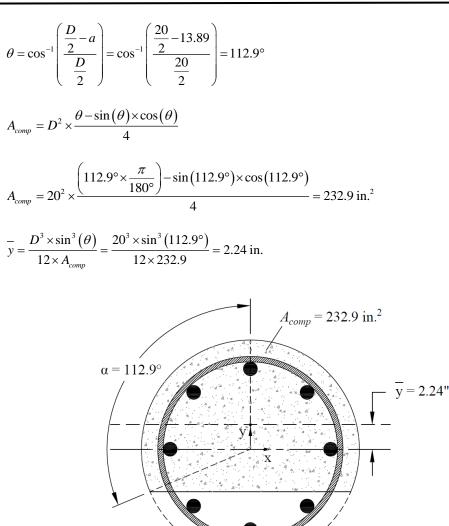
Cracked Column Section Properties ($\varepsilon_t = f_s = 0$)
